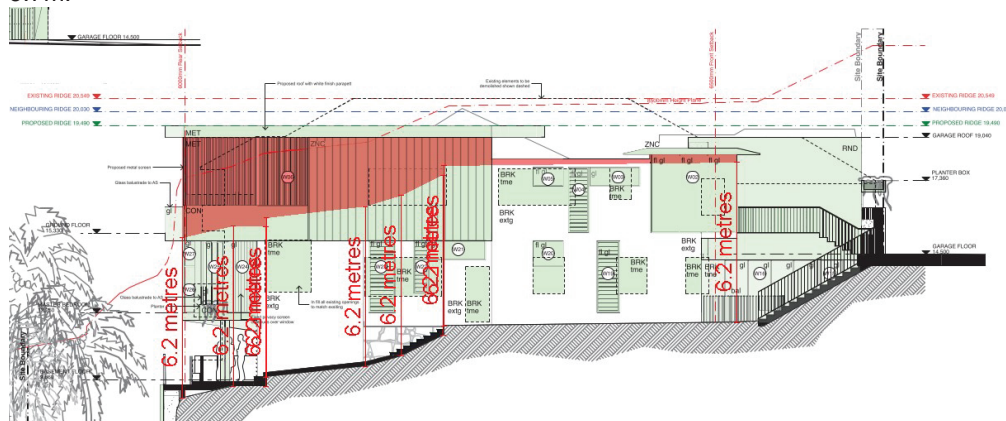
Extract from the Eastern Elevation with side boundary envelope encroachment in red
